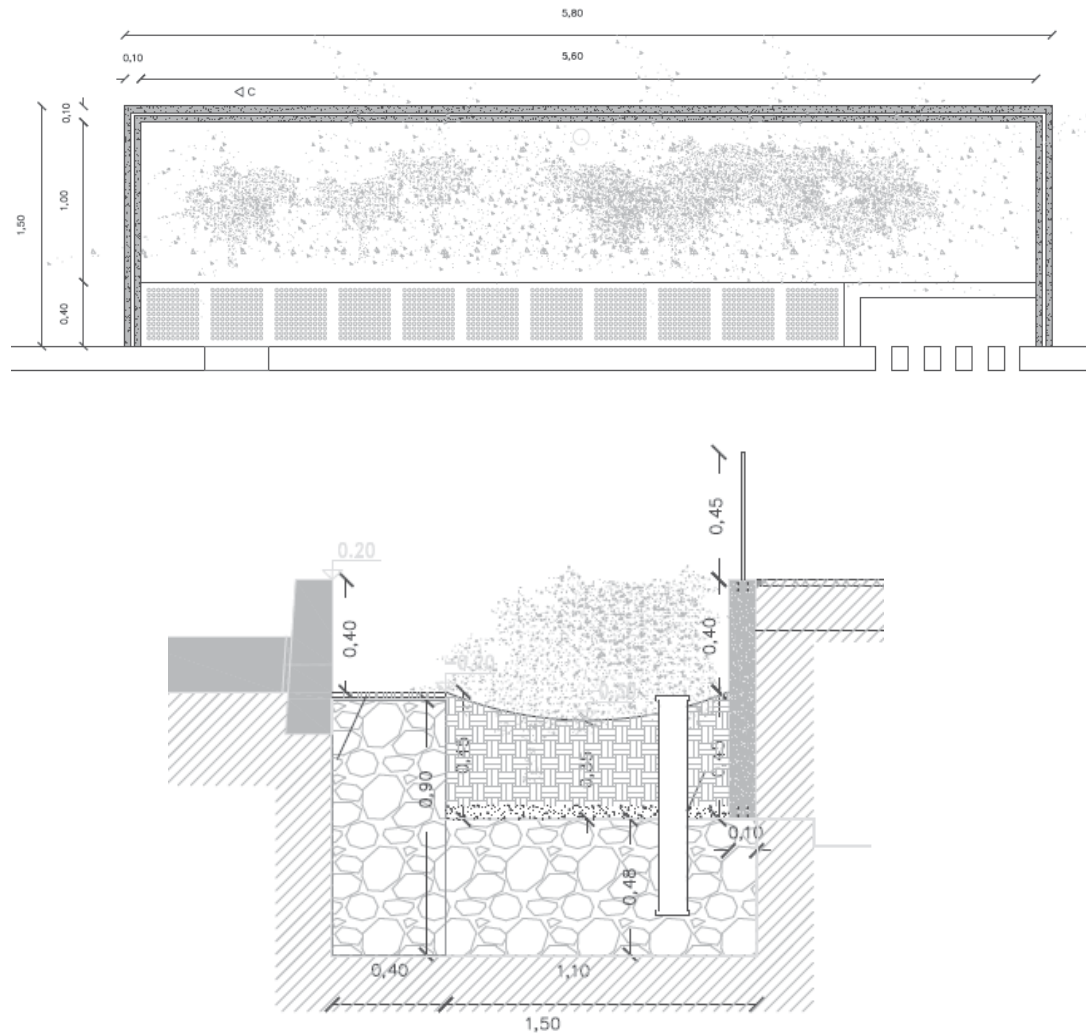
Rain Garden dimension extracted from blueprint “Plano Tipo Jardines de Lluvia” 2018 SEPS Montevideo City Hall.
